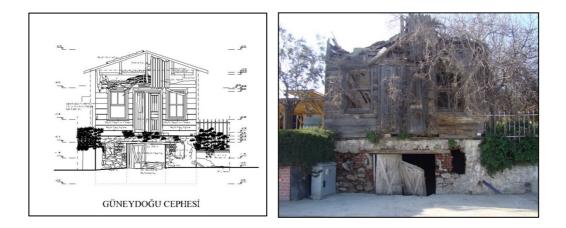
Drawing and photo of Southeast Facade (Tanrıverdi, 2011)
